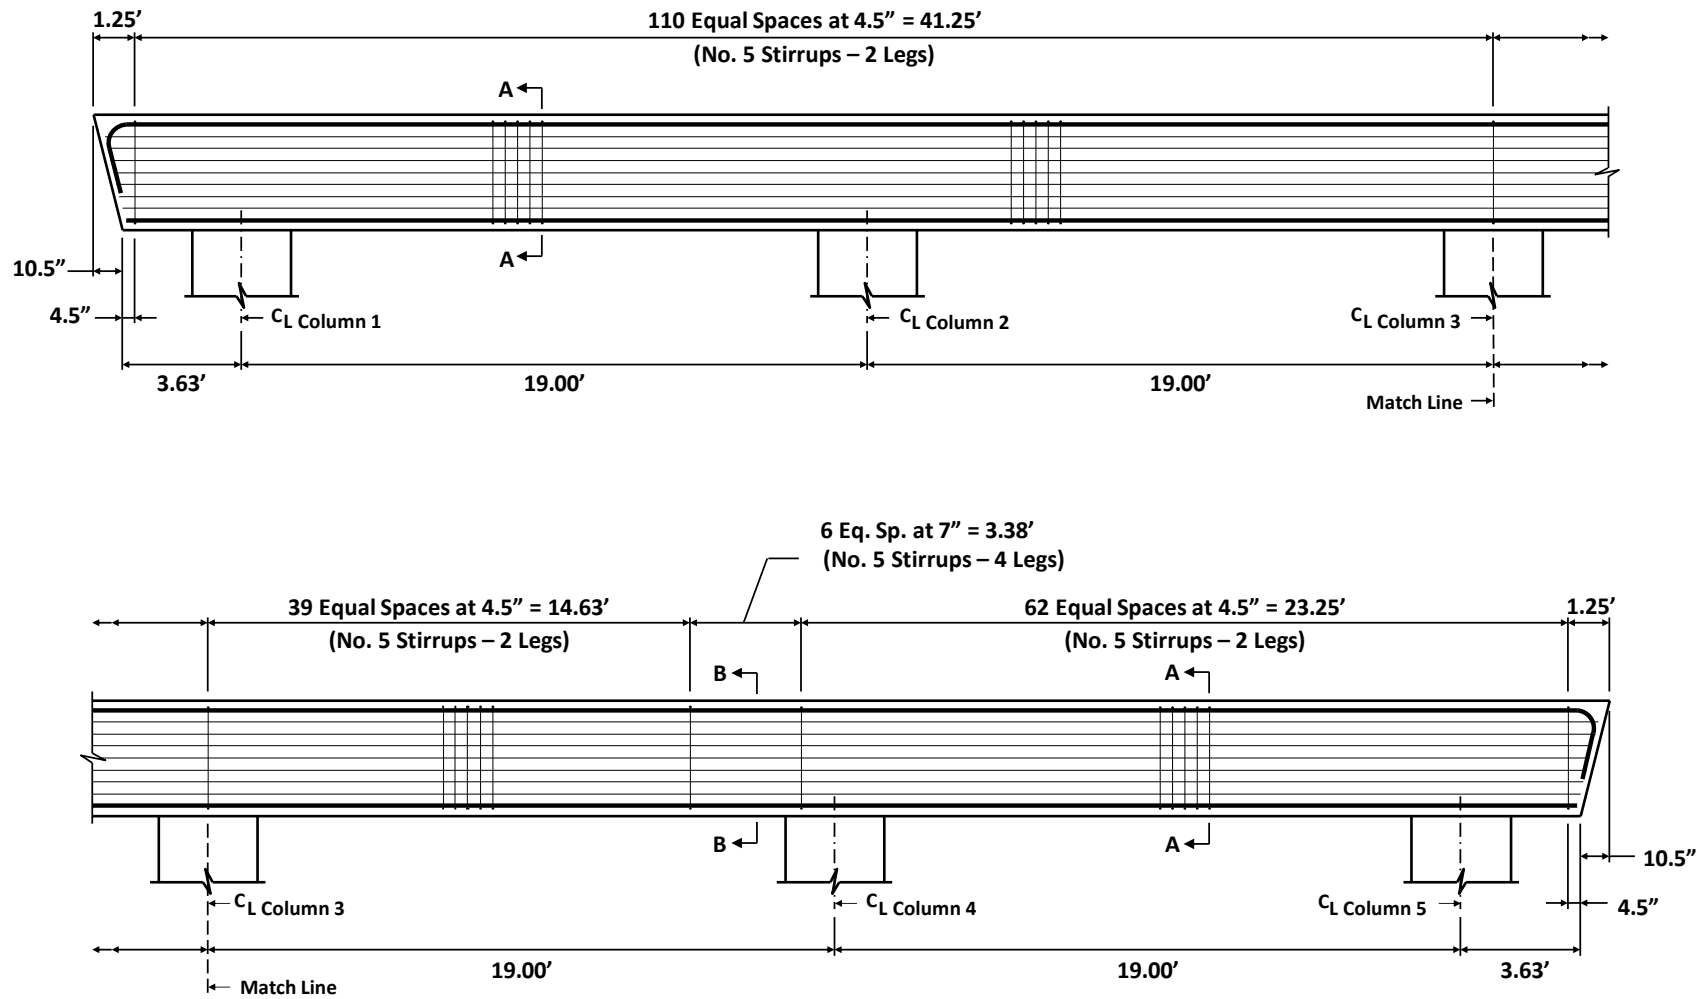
Elevation with Reinforcement Details based on Program Output- Bent Cap (from Williams et al., 2012)
